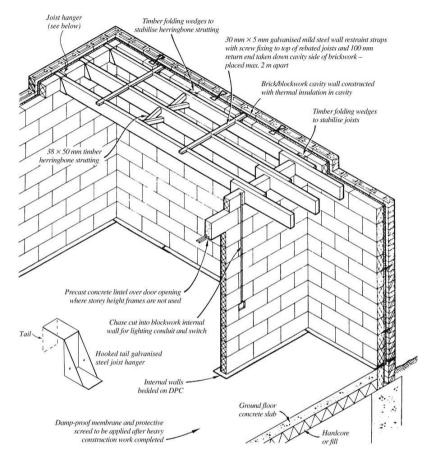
Lateral bracing of walls by intermediate floor construction.
